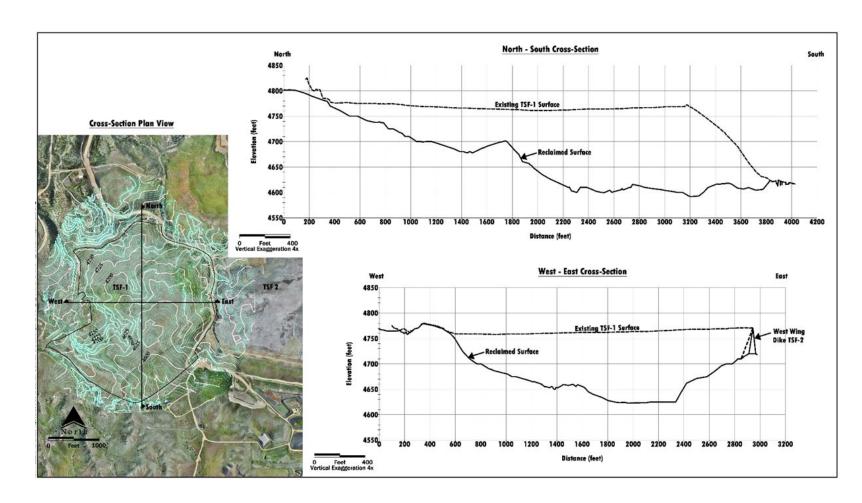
Final Grading Plan for Tailings Storage Facility 1 (GSM 2021a)
